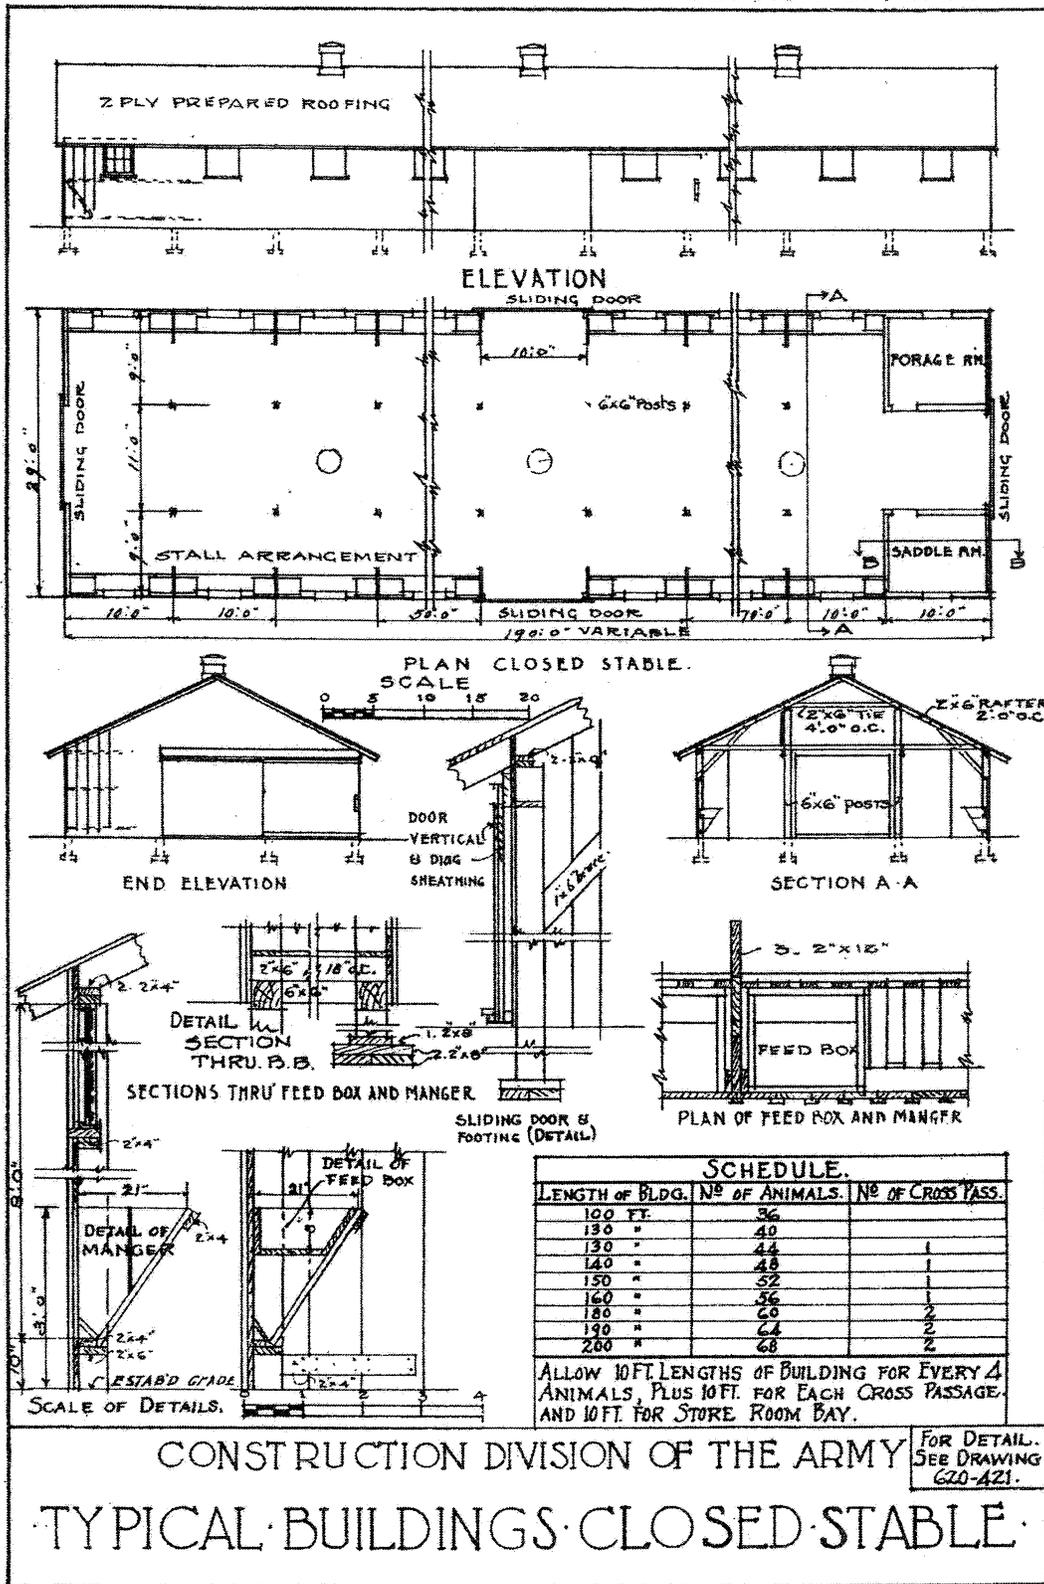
"TYPICAL BUILDINGS, CLOSED STABLE." A 1919 STANDARDIZED Q.M.C. PLAN VERY SIMILAR TO FORT HUACHUCA'S CAVALRY STABLES (CONSTRUCTION DIVISION OF THE ARMY 1919:SECTION C PLATE 58).
